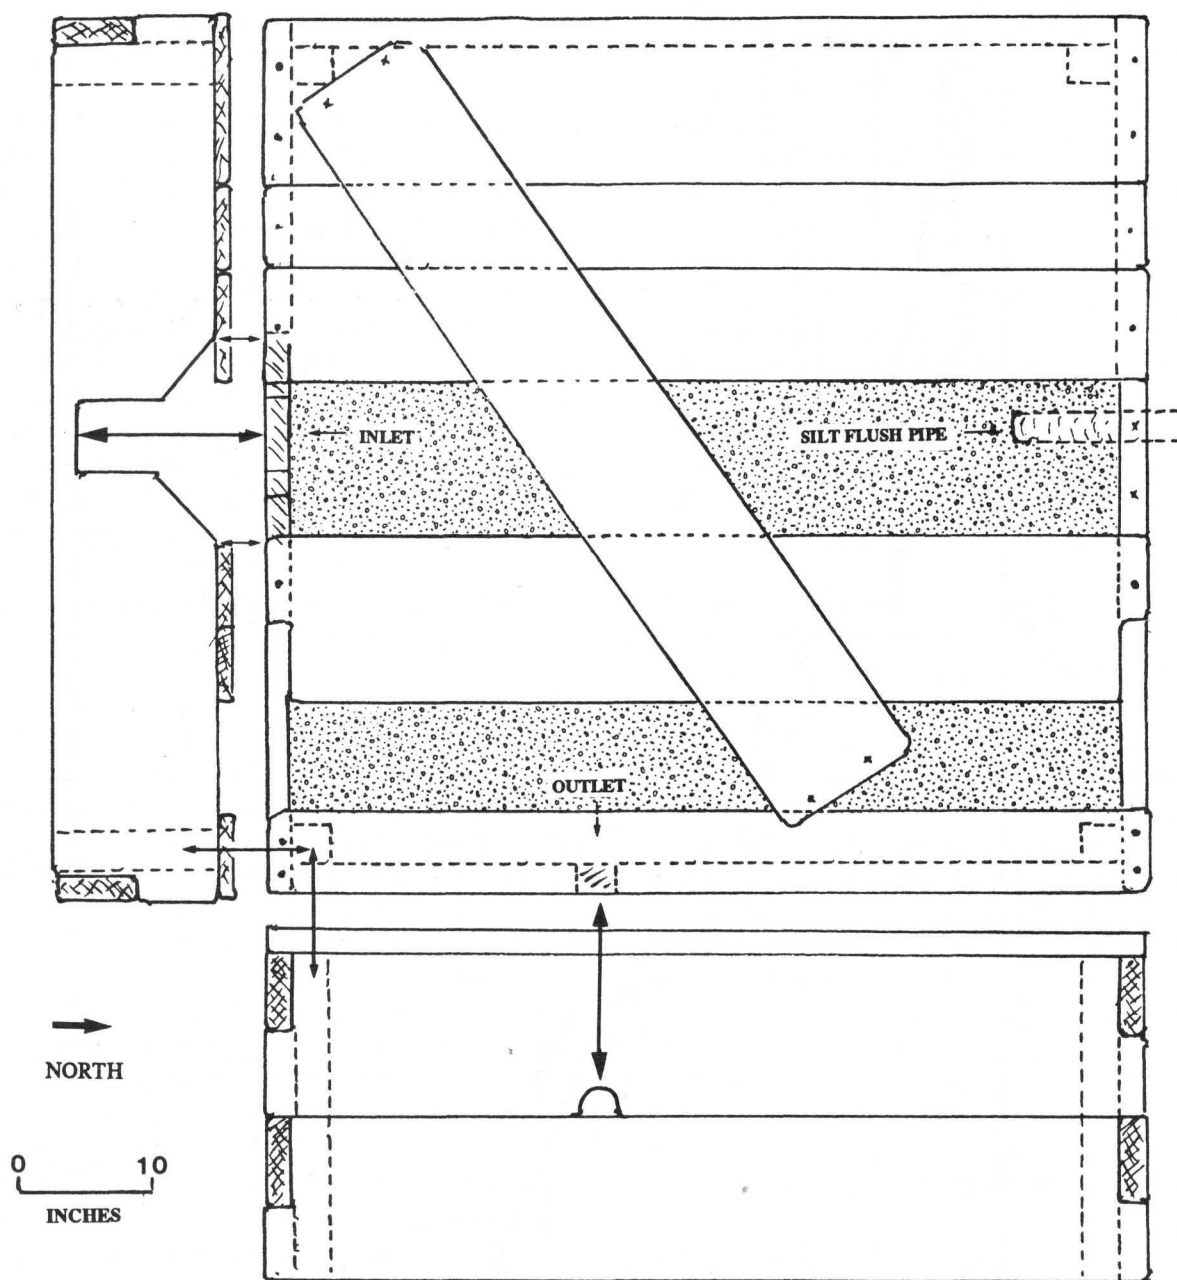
Feature 1, plan view of sedimentation box depicting south (inlet) and east (outlet) facing sides.
